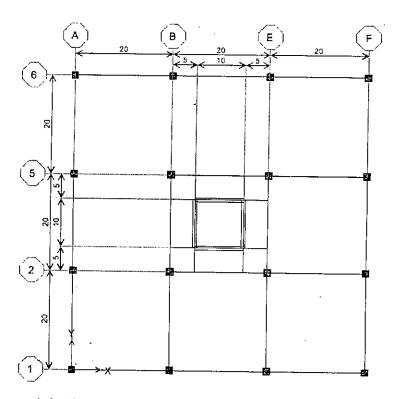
Plan view of ground floor in 20'x20' floor panel model
